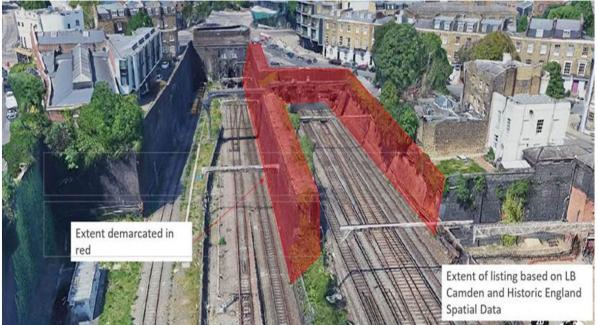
Parkway Tunnel and Cutting Listed Walls
